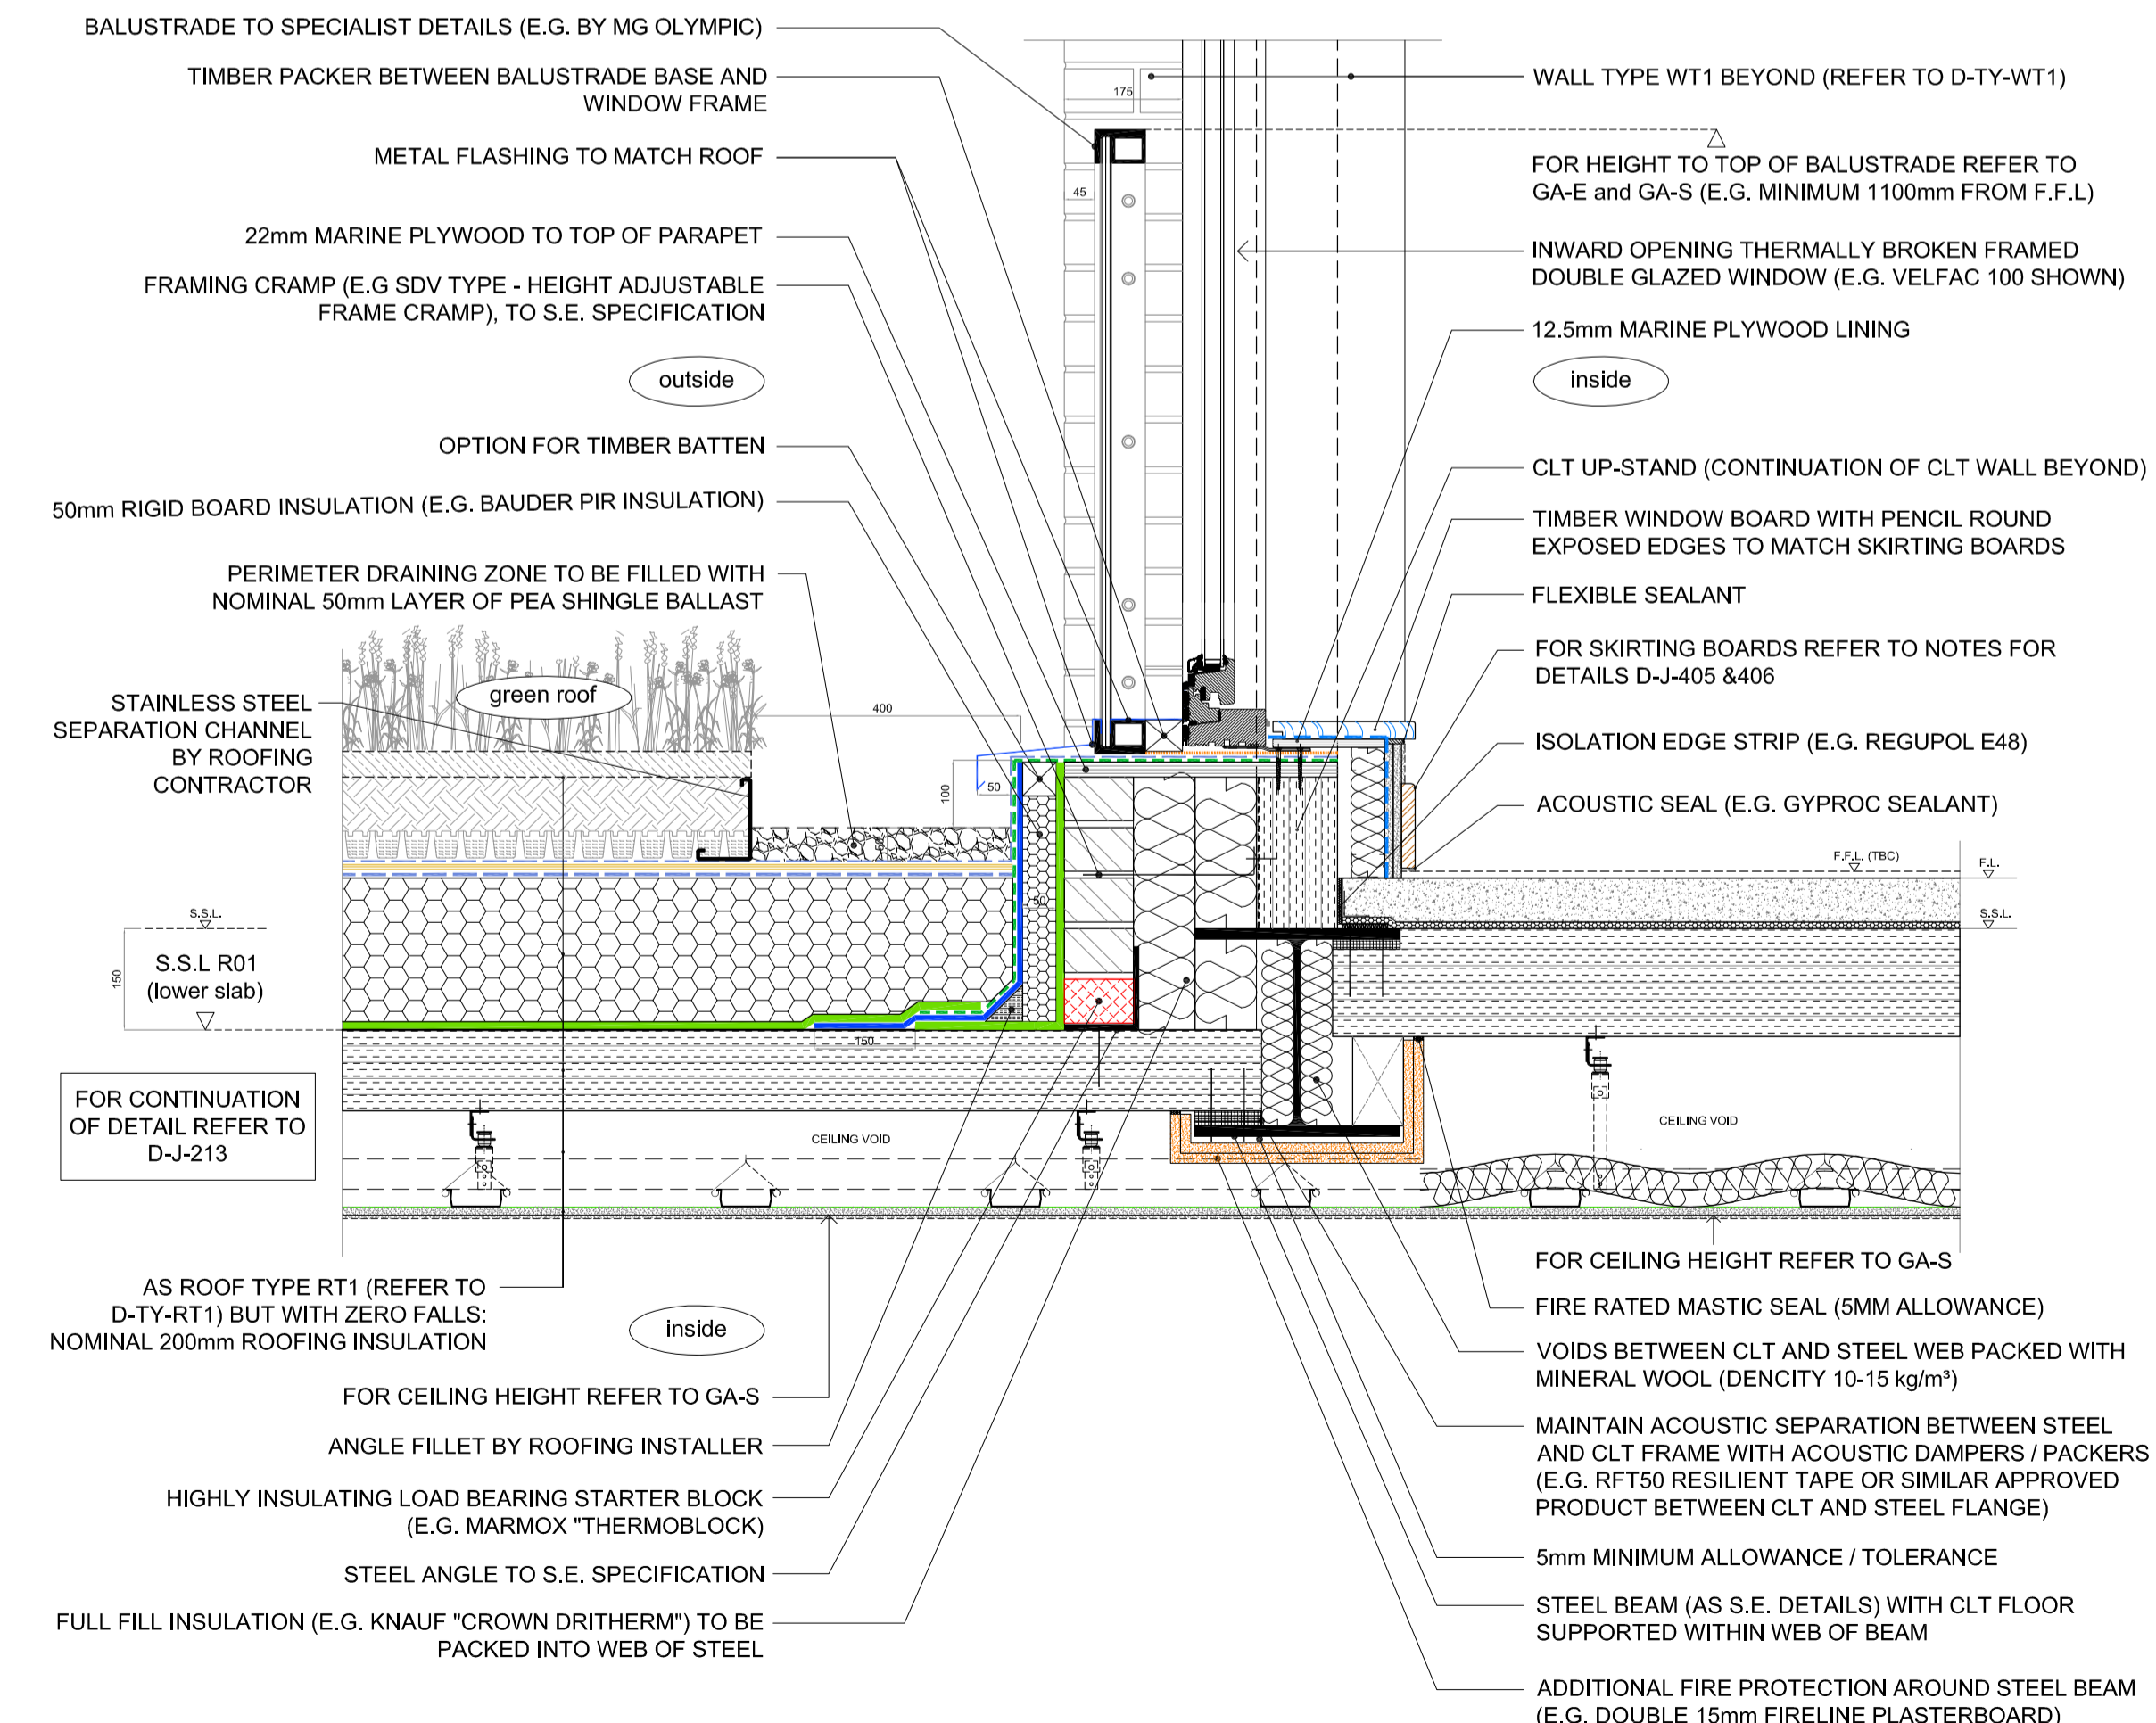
Block A - Juliet Balcony above outward opening ground floor door
